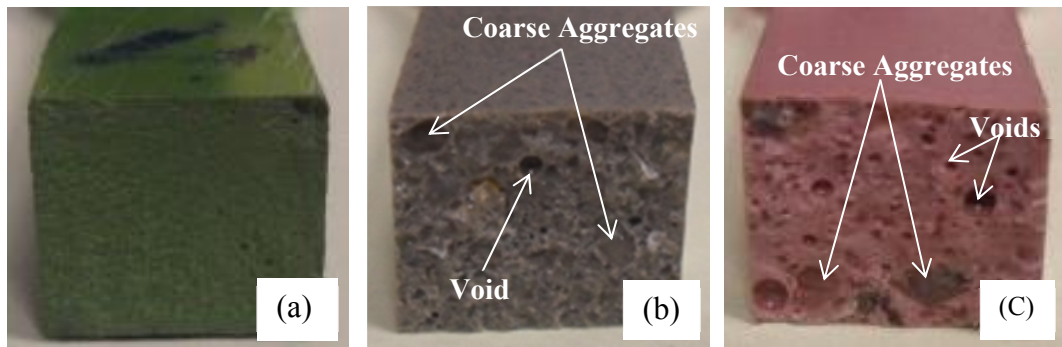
Typical failure surface of tensile specimens; (a) grout B, (b) grout D and (c) grout E
